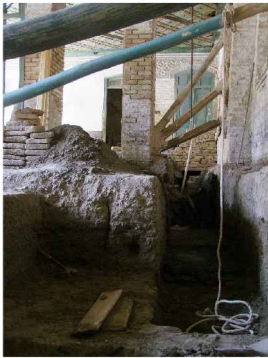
The traditional foundation of Darugheh House, (location: *hoz-khaneh*, pond room); it is made of artificial ground on the virgin soil, construction of a layer of mud-lime mortar along with a wide brick wall at the lower part floor to diagonally transmit the force from the masonry to the foundation.
